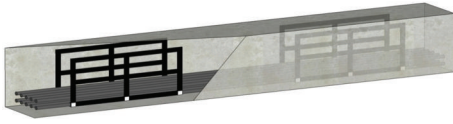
Schematic view of a concrete beam reinforced with GFRP plates.
